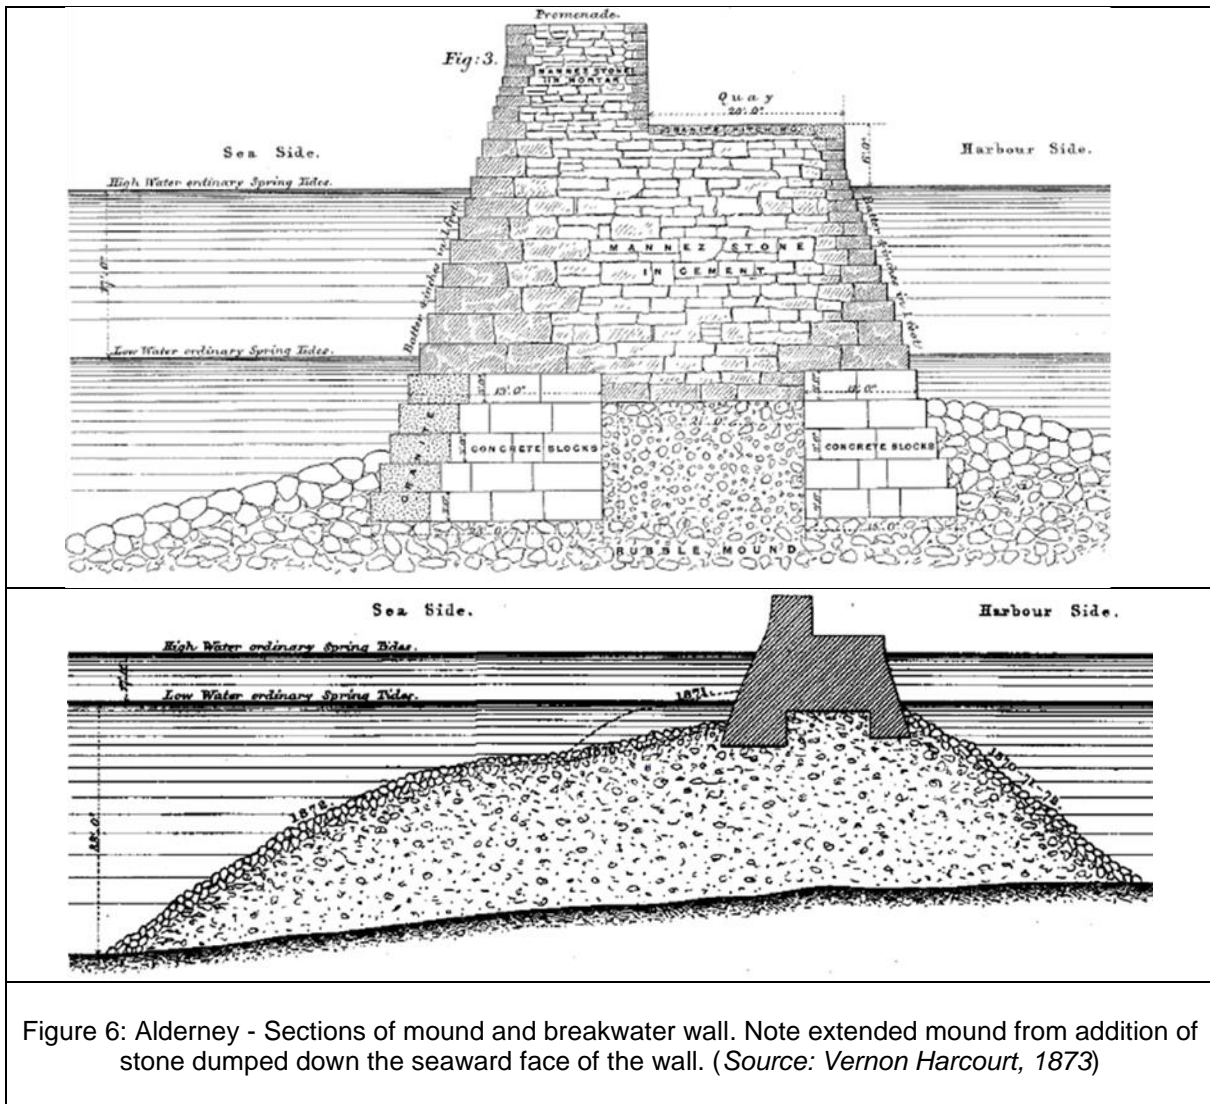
Alderney - Sections of mound and breakwater wall. Note extended mound from addition of stone dumped down the seaward face of the wall. (Source: Vernon Harcourt, 1873)
